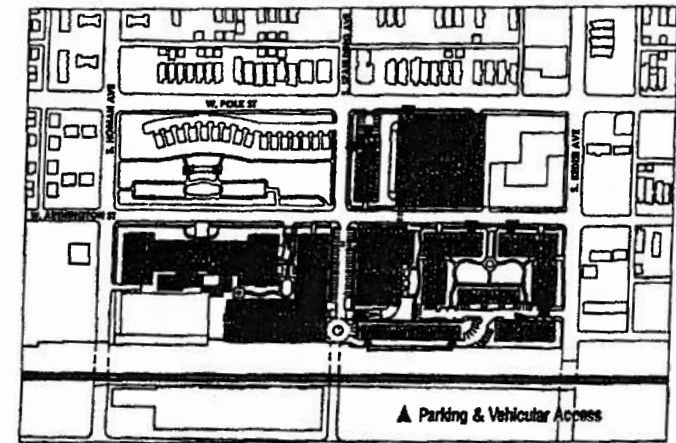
Conceptual Location of Parking and Vehicular Access
